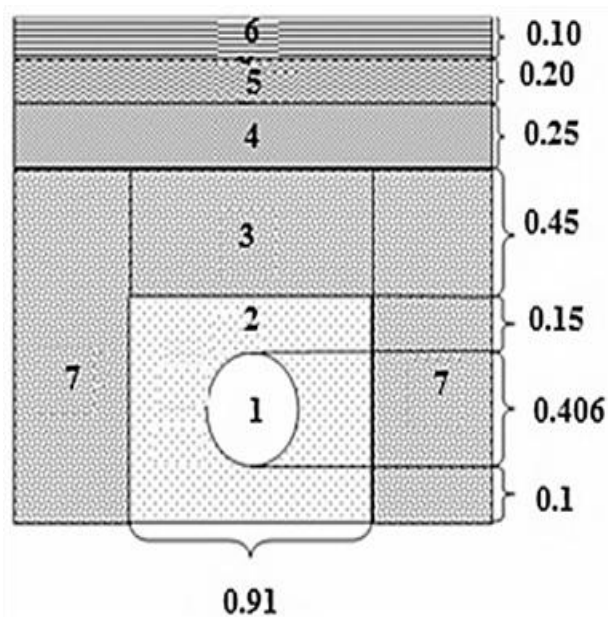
2D schematic of the pipe installed in the trench (dimensions in meter)
